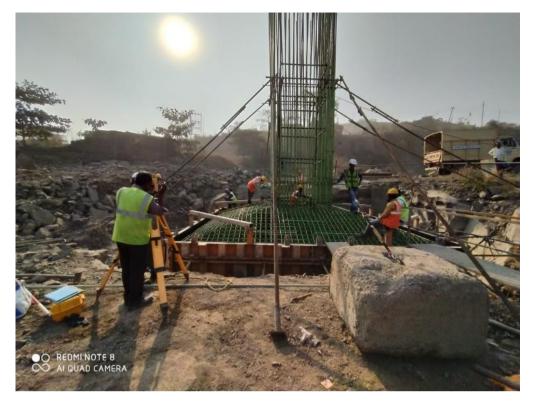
Foundation co-ordinates checking at Jasai area is in progress
